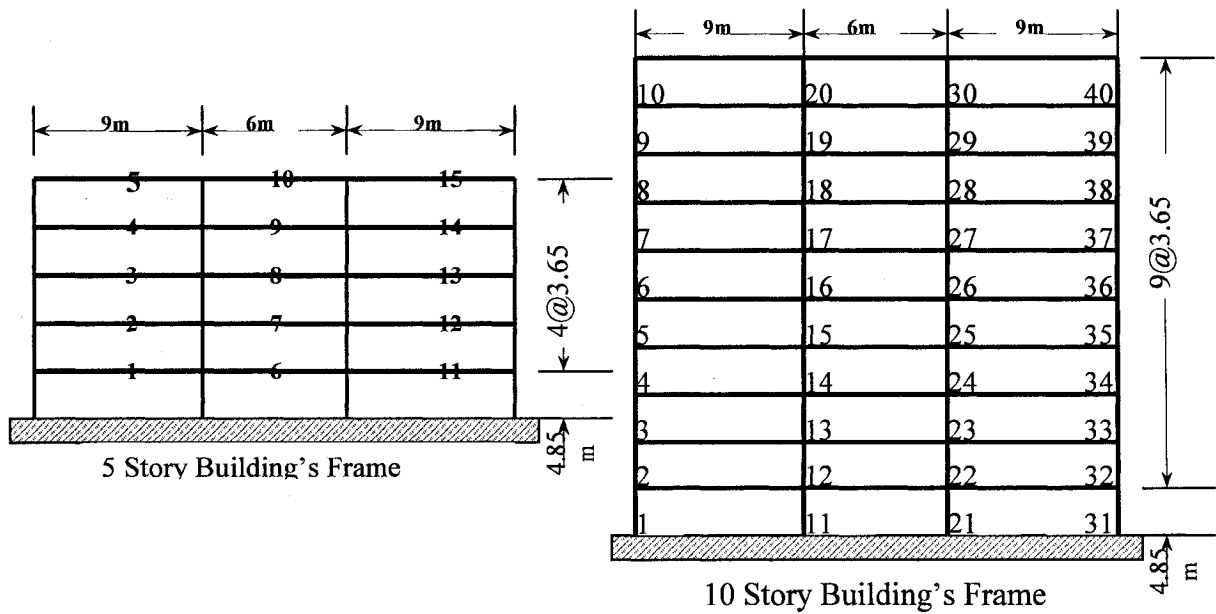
(a): Elevation of 5 & 10 Story Frames
